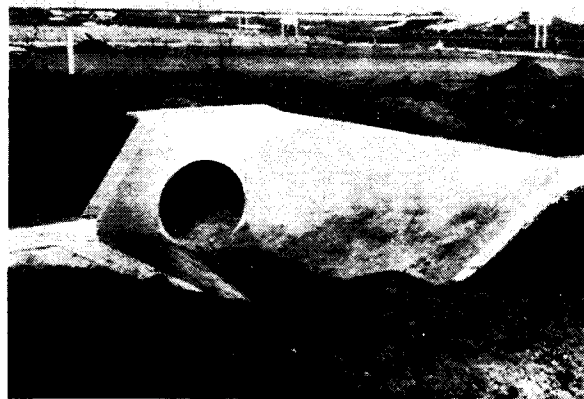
In-place precast concrete transition, partially backfilled. PX-D-72830
